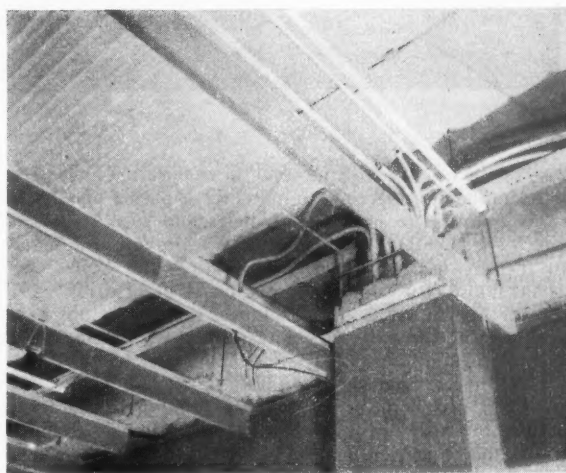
Showing acoustical baffle rails resting on wall angles. Power wiring carried in bottom of rails. Electrical distribution panel is on lower part of column.
